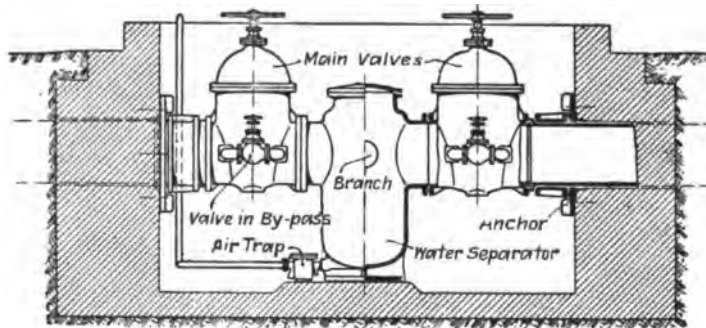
Compressed Air Plant. Valve Chamber with Branch Pipe and Drainage.
